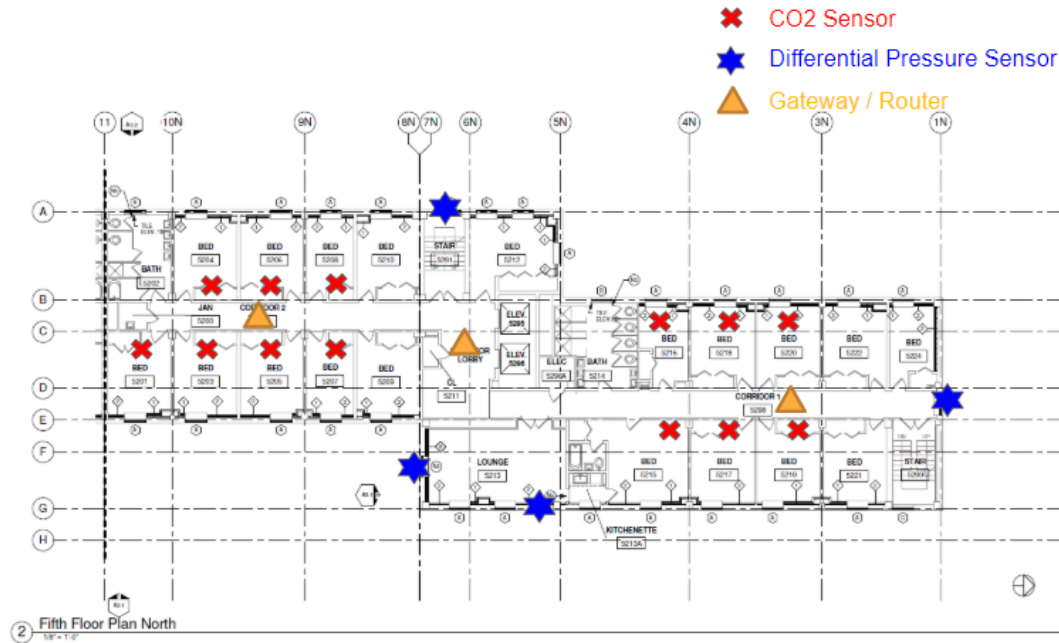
Sensor deployment plan for the fifth floor of Building B.
